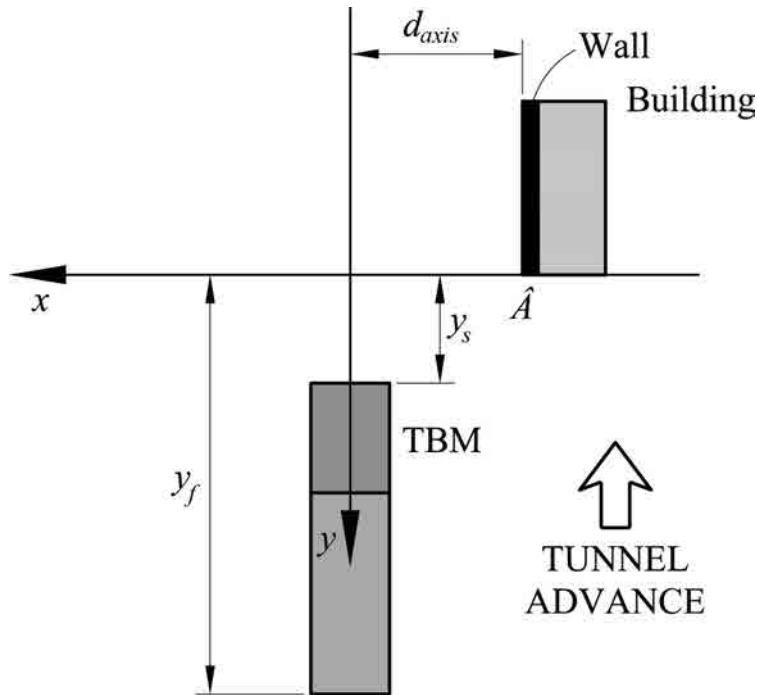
Parameters of tunnel and building position (case of parallel walls with respect to the tunnel axis).
